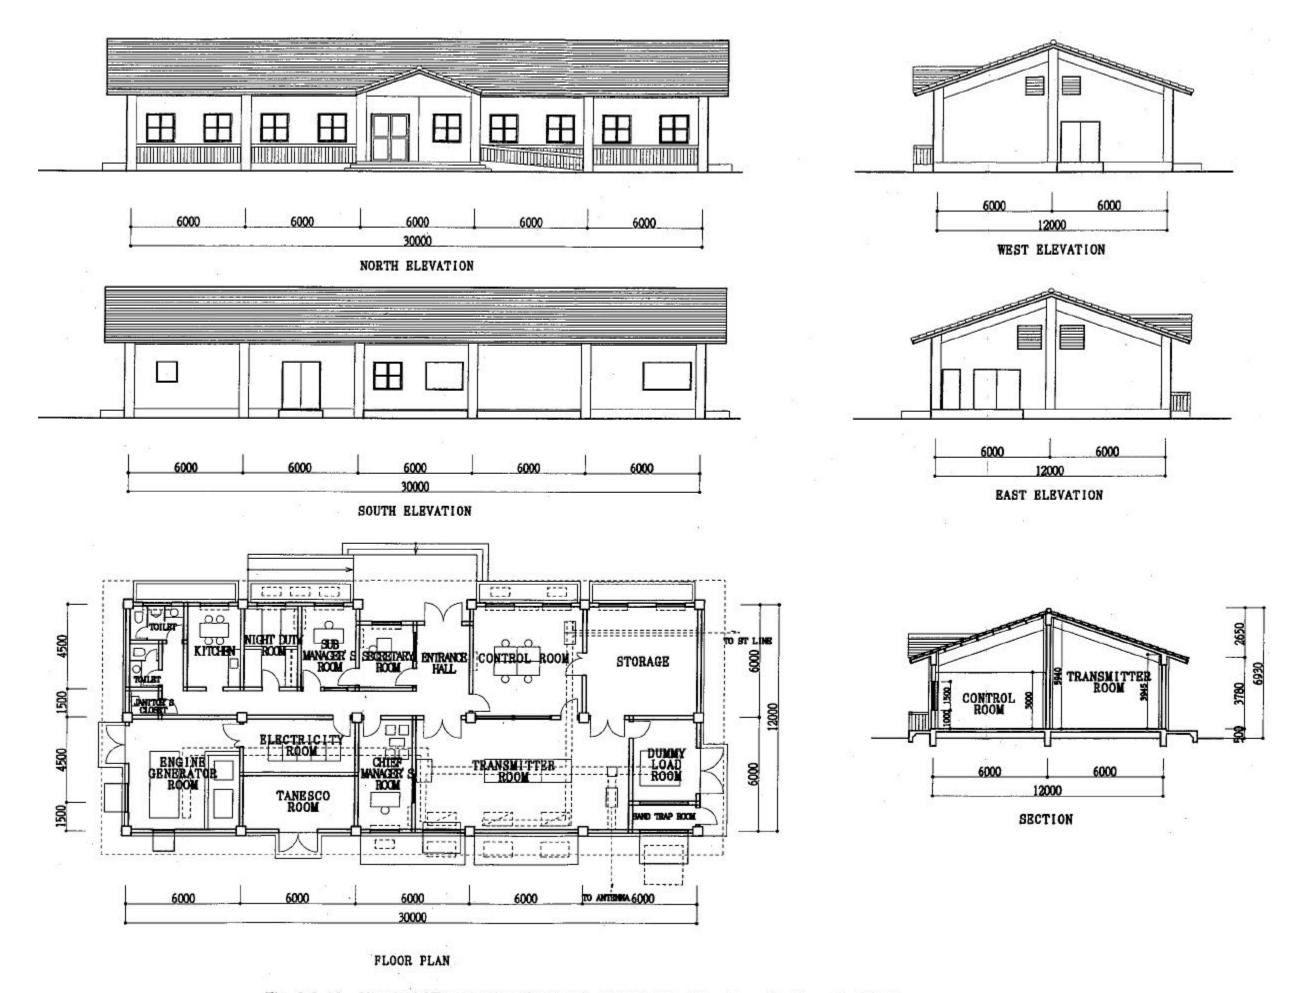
Kunduchi Transmitting Station Building / Plan Elevation Section S=1/200
